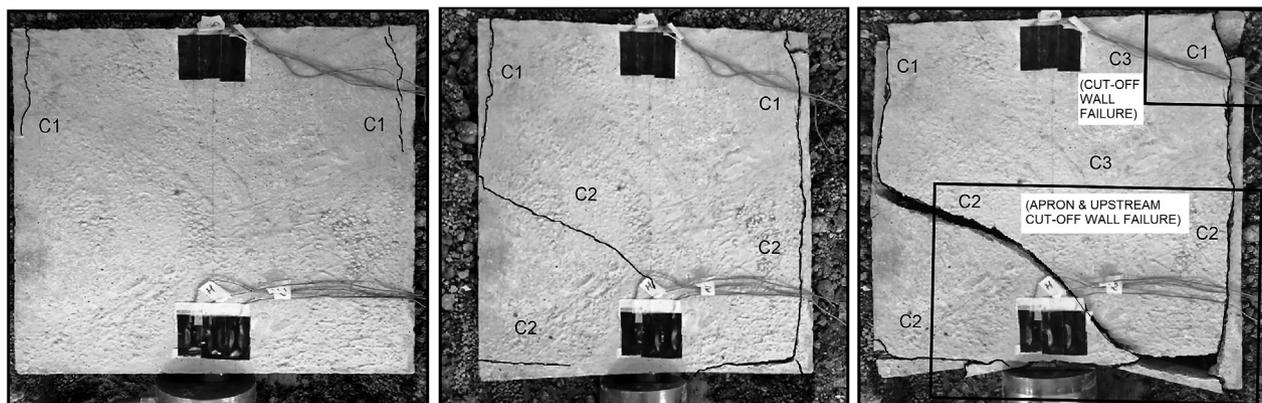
Crack propagation within concrete floodway Specimen 1.
